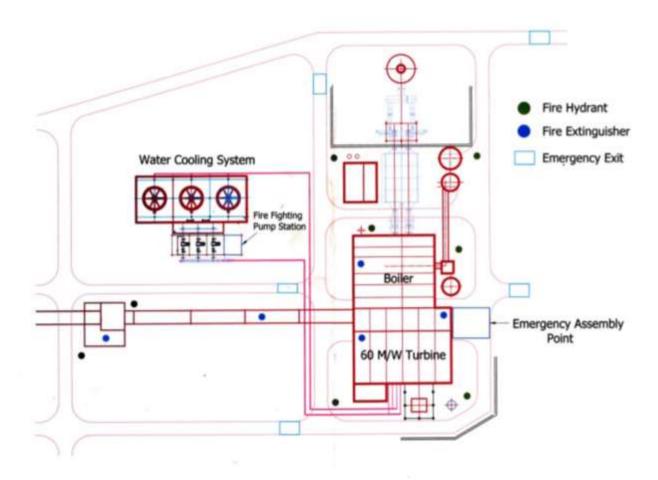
Layout plan for fire emergency plan (showing spots where hydrants, extinguishers, emergency exit and assembly point
